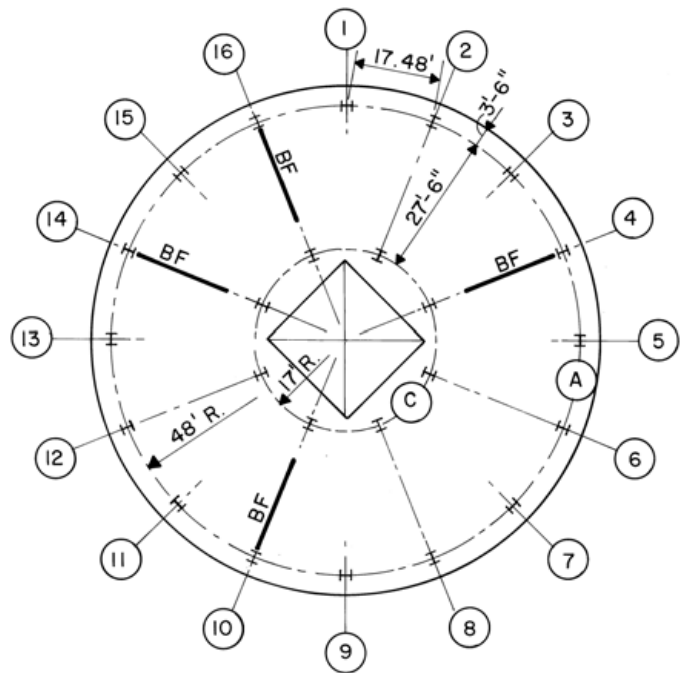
Schematic plan of typical floor of hotel tower. The mark BF denotes a radial braced frame. Framing for core of building is not shown.
